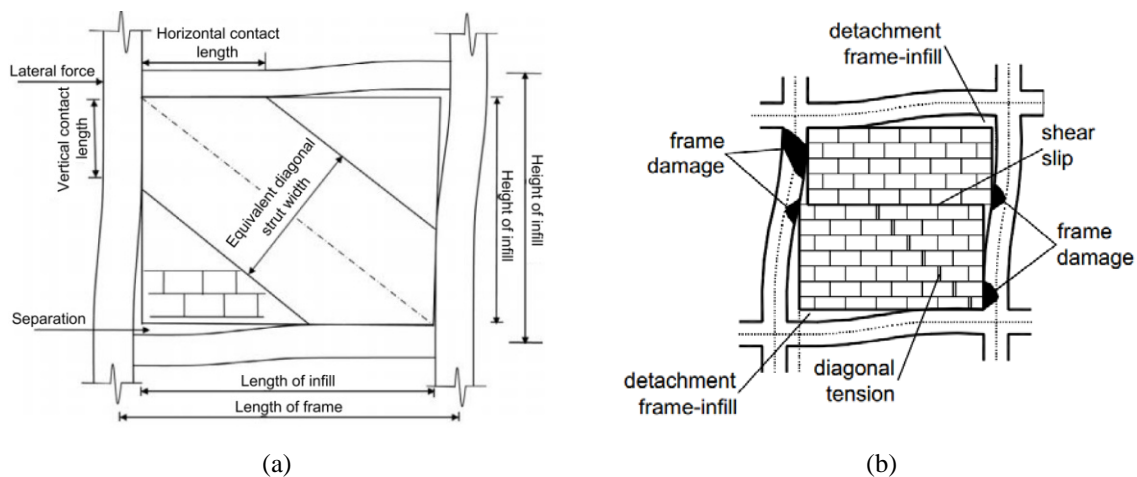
Behavior of masonry-infilled frame under lateral loading : diagonal strut mechanism [3] (a) and failure modes [11] (b)
